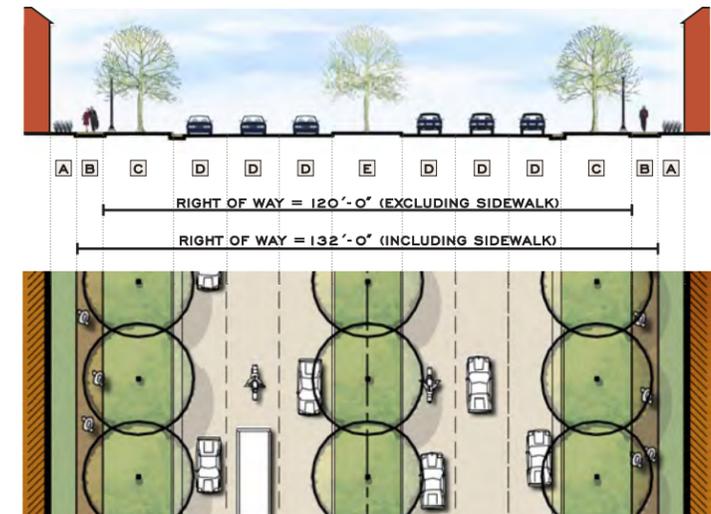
Falmouth Village Street Section & Plan – Cambridge Street/Jefferson Davis Highway (US-1)
